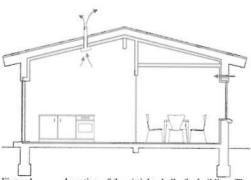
Location of the airtight shell of a building. The shell follows the building envelope, which consists of lightweight or heavyweight building components like wood-stud walls and concrete wall elements, respectively, combined with windows, doors, ceilings, and roof and floor-slab constructions.
